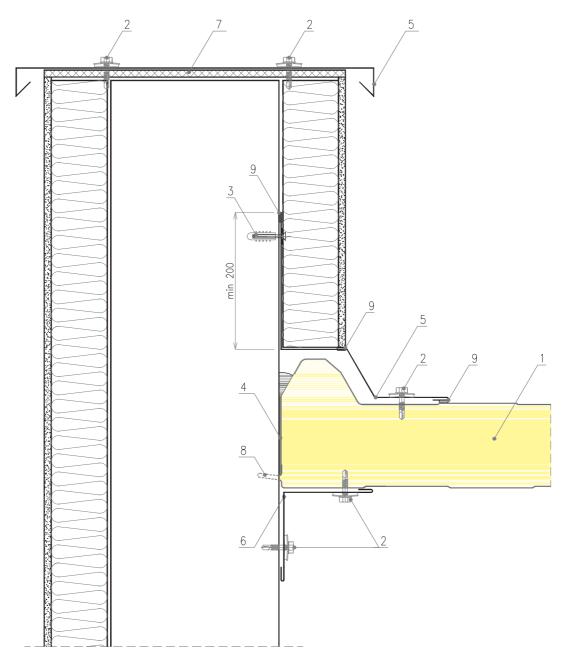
IzoRoof PIR/PIR+; MWF; EPS - joint of brick wall protruding over the roof
